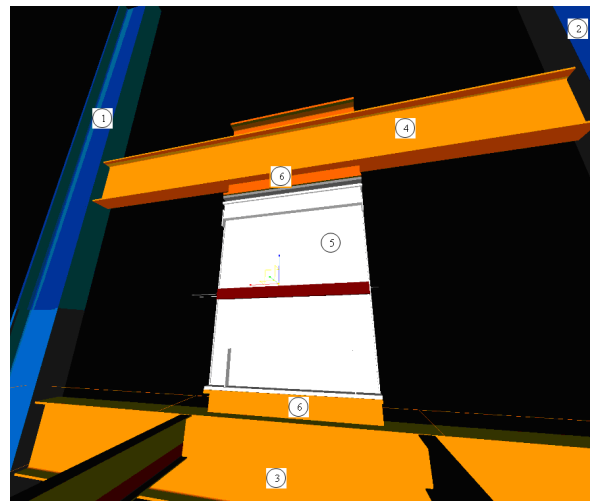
A 3D Rendering of A VDW on Structural Steel. Captions: (1) and (2) Columns; (3) Lower Girder; (4) Upper Girder; (5) VDW; (6) T Shaped Steel to Connect Girders and the VDW.
